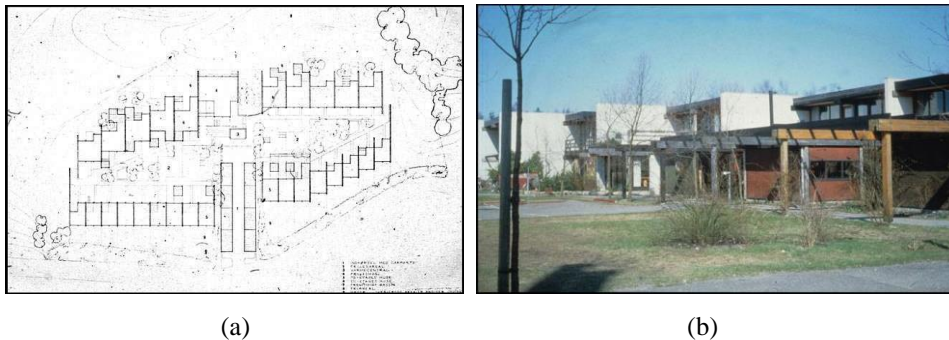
(a) Sættedammen ground floor plan and (b) Sættedammen central courtyard
